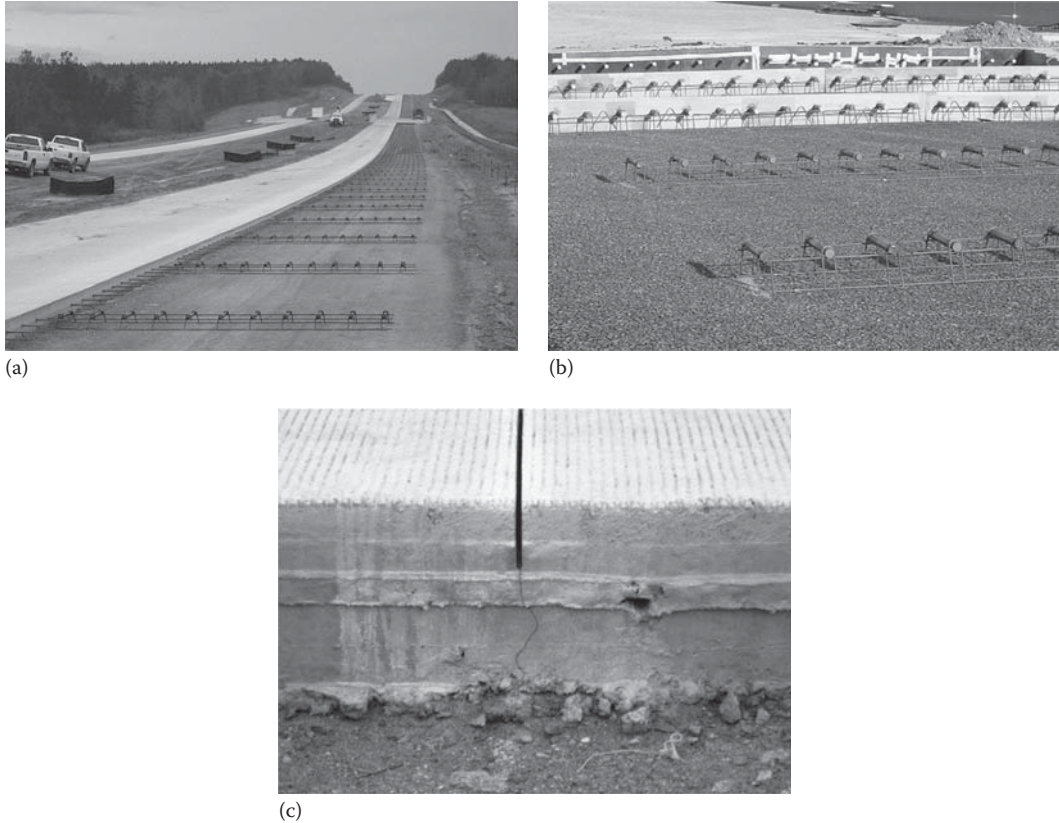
(a) Jointed plain concrete pavements (JPCP) with tiebars and dowel bars set for construction of adjacent lane, (b) JPCP under construction with header and dowel with basket assembly, and (c) JPCP showing sawed joint and crack below cut.
